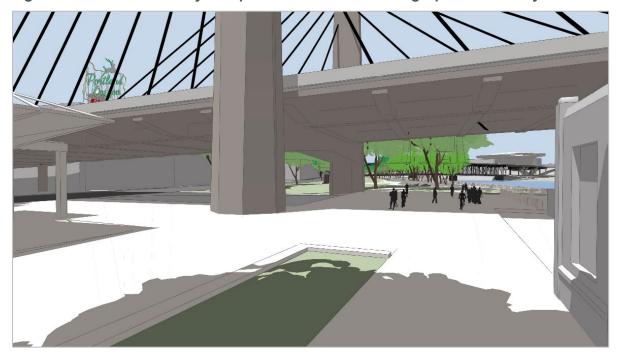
View from Ankeny Pump Station – Refined Long-Span Girder
